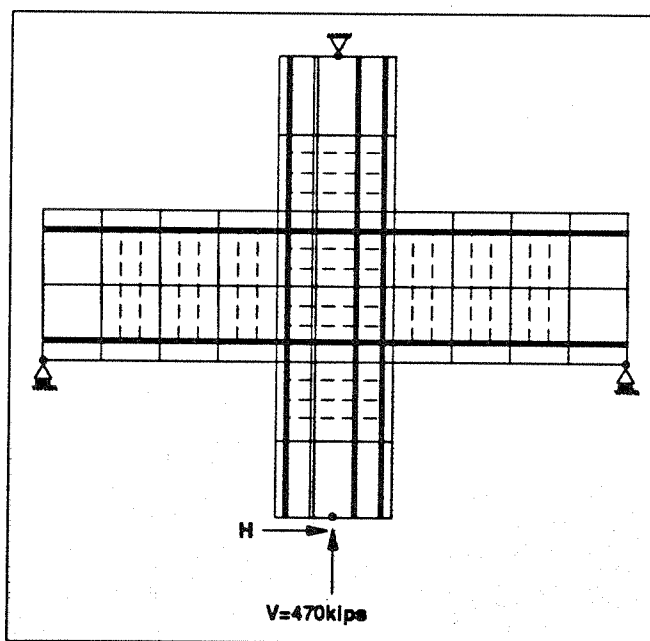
Finite Element Idealization of Beam to Column Subassemblage
